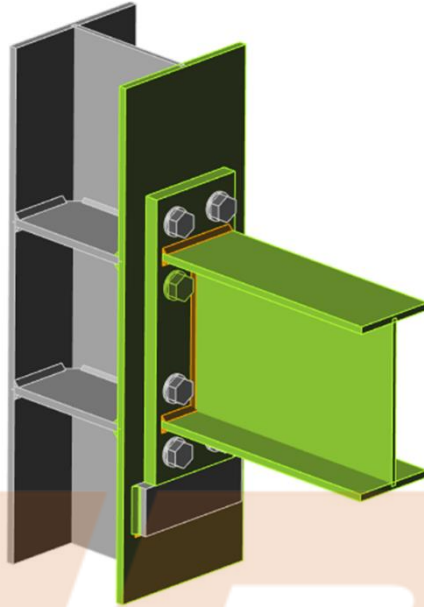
An example of edge to edge contact between the seat and the end plate.
